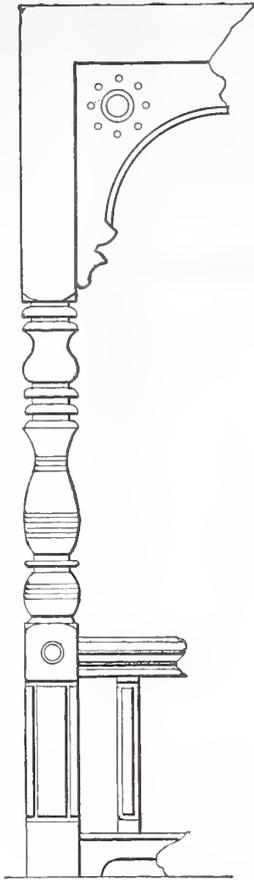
Elevation of Post, Rail, Bracket, &c.—Front Piazza.—Scale, $\frac{1}{2}$ Inch to the Foot.
